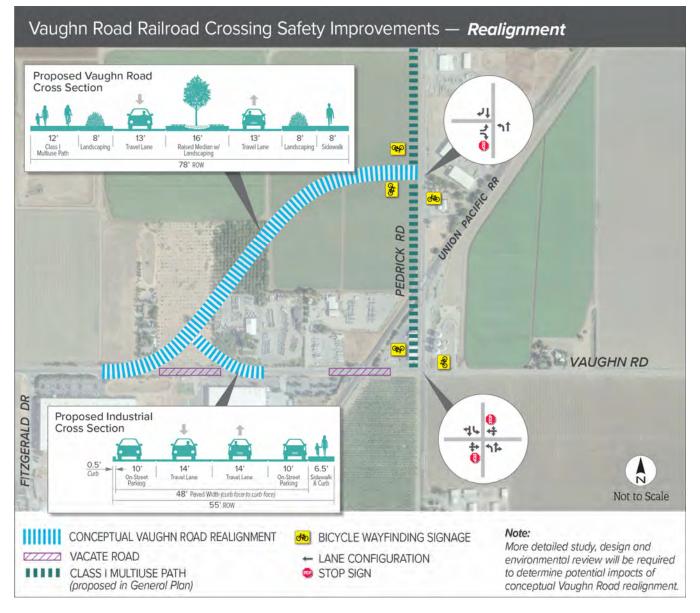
VAUGHN ROAD REALIGNMENT AND AT-GRADE RAILROAD CROSSING CLOSURE
